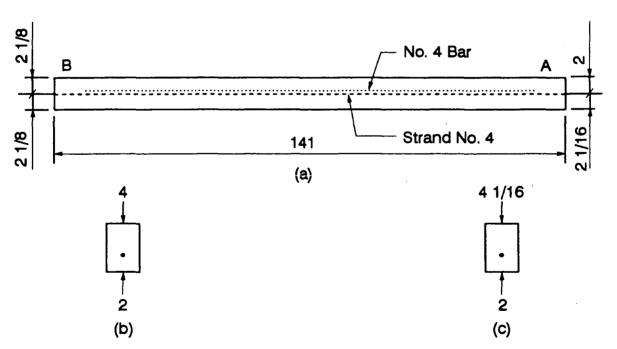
Specimen No. 11-6.0DU-4 (dimensions shown in inches):
